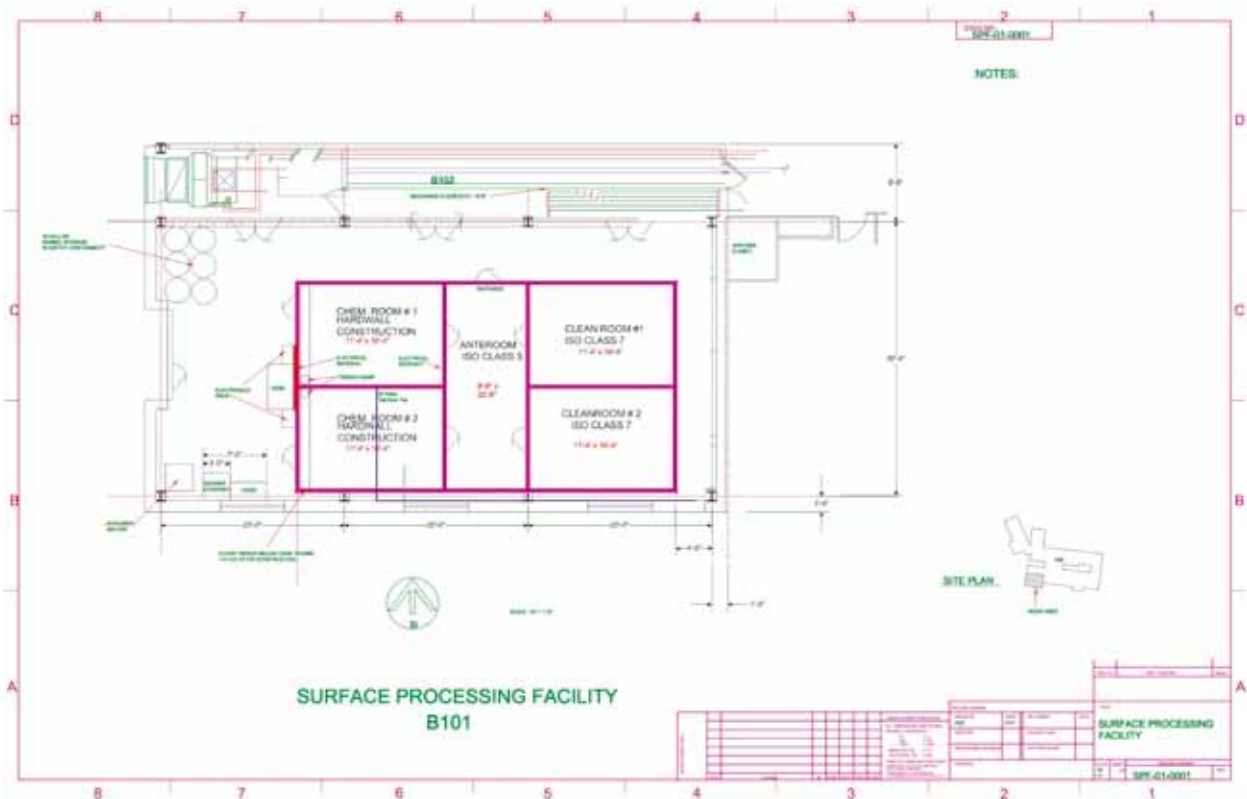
Layout of the ANL/Fermilab surface processing facility.
